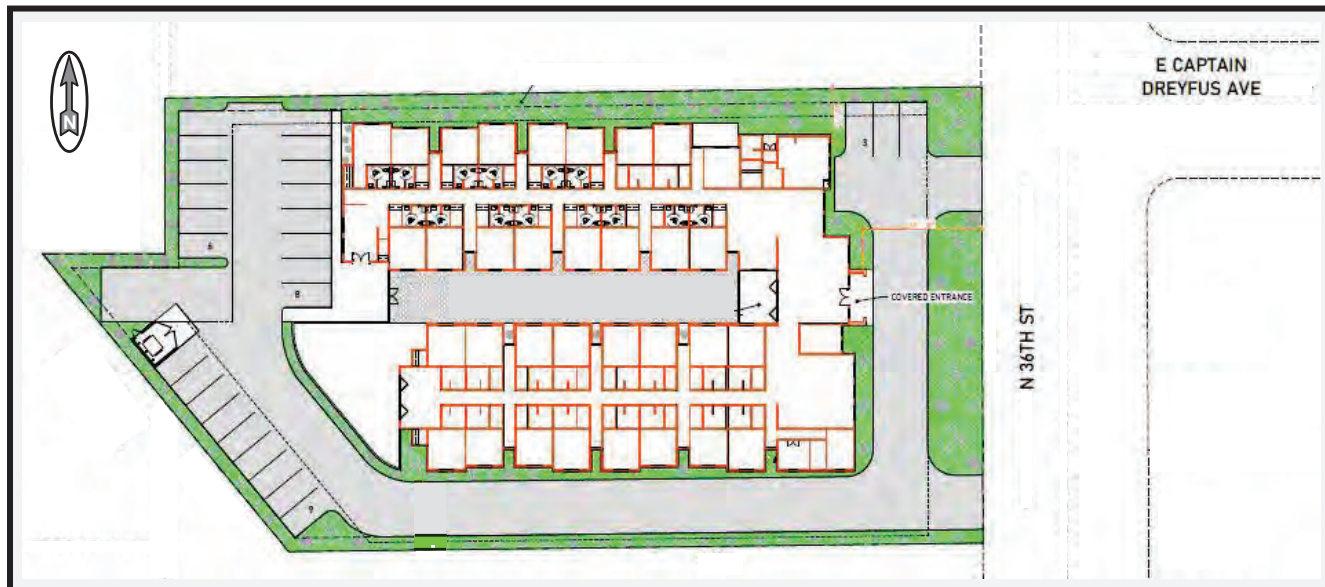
Proposed Assisted Living Facility Preliminary Site Plan
